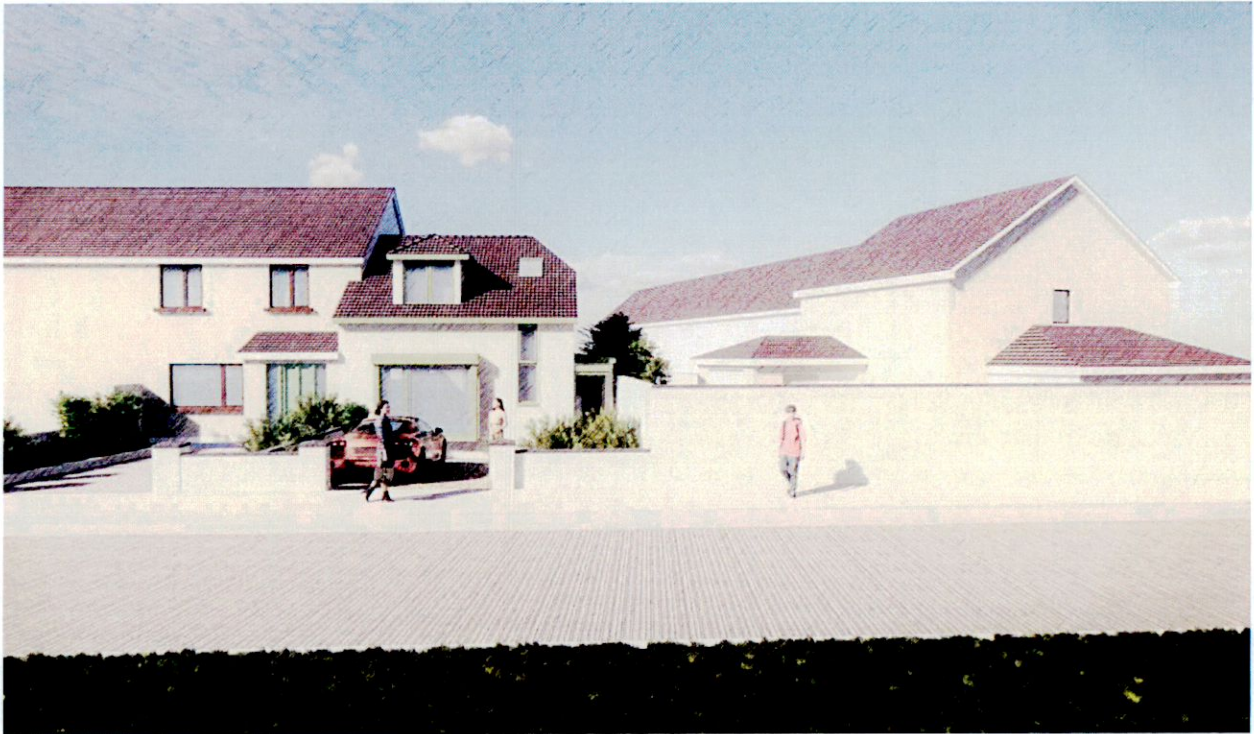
House the proposed house has been designed to mitigate the impact on neighbouring properties.
